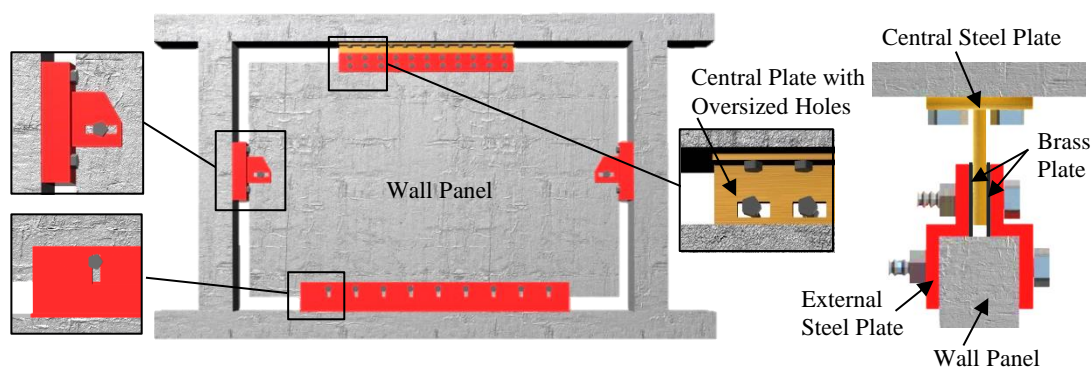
Schematic view of the adopted friction-based wall damper and the utilised slotted bolted connection
